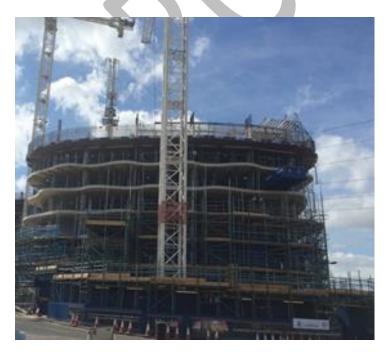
Building under construction showing cranes and scaffolding – photograph courtesy of Brian Massie
